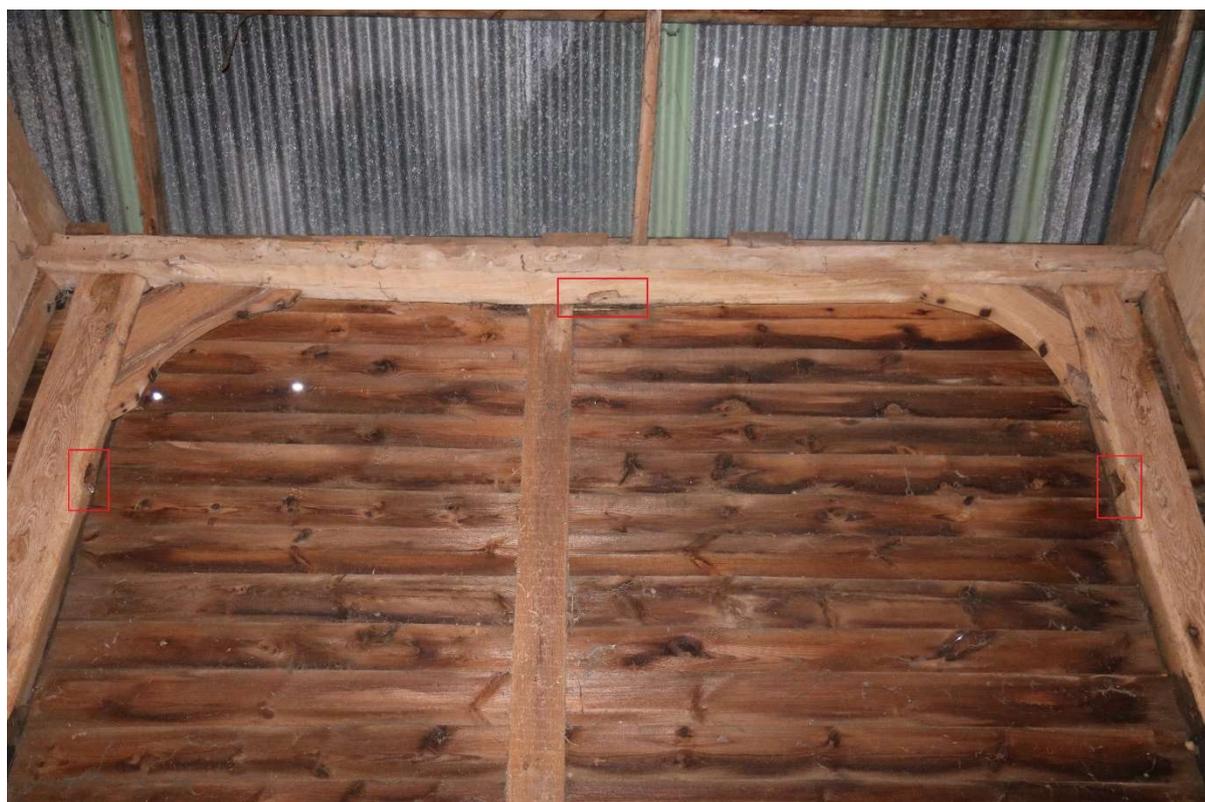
Detail of scarf joint in wall-plate of north-western wall of bay 2 of threshing barn A. Photograph taken facing west north-west.
